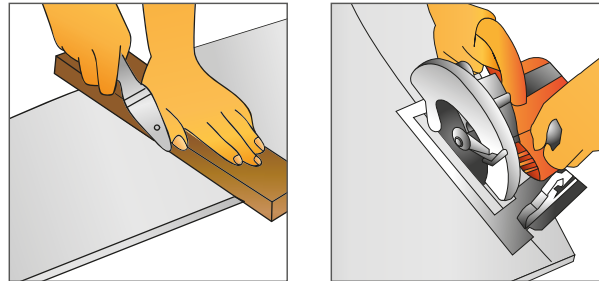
Score and Snap Method (left), Machine Cut (right)
